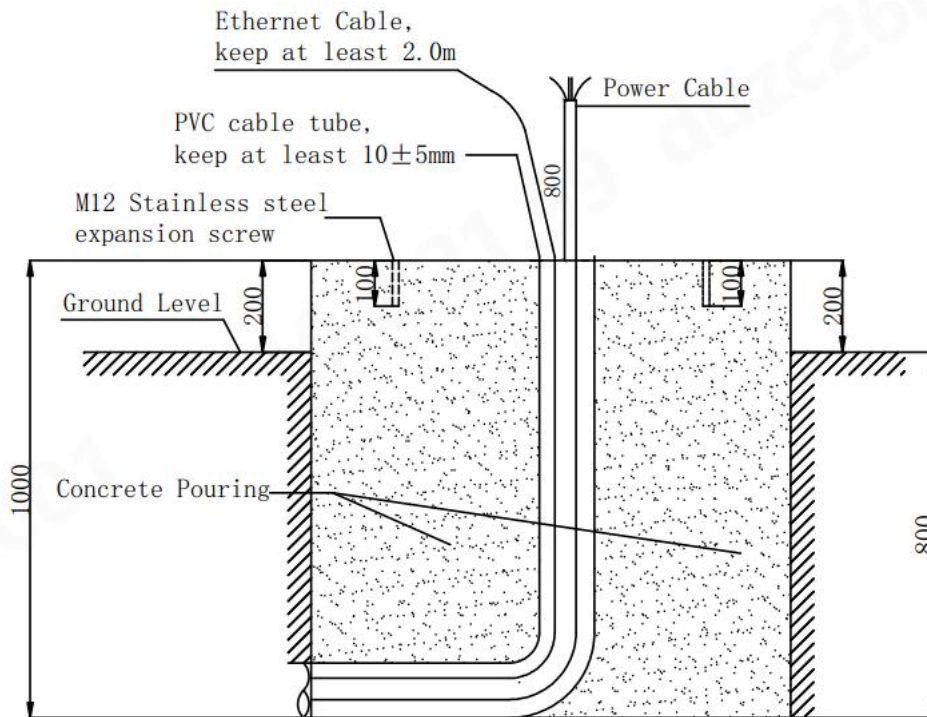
Diagram of Concrete Pouring Requirements (unit: mm)
